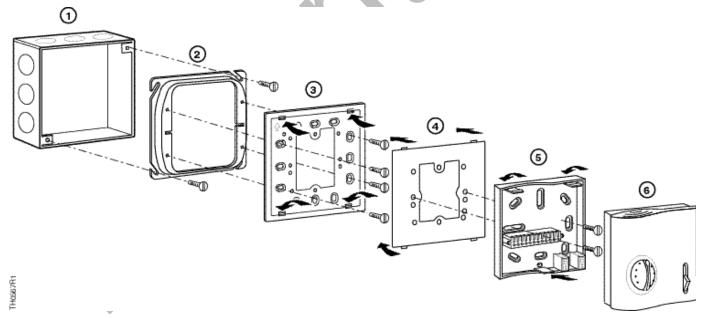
4-inch × 4-inch Electrical Wall Box Installation.
